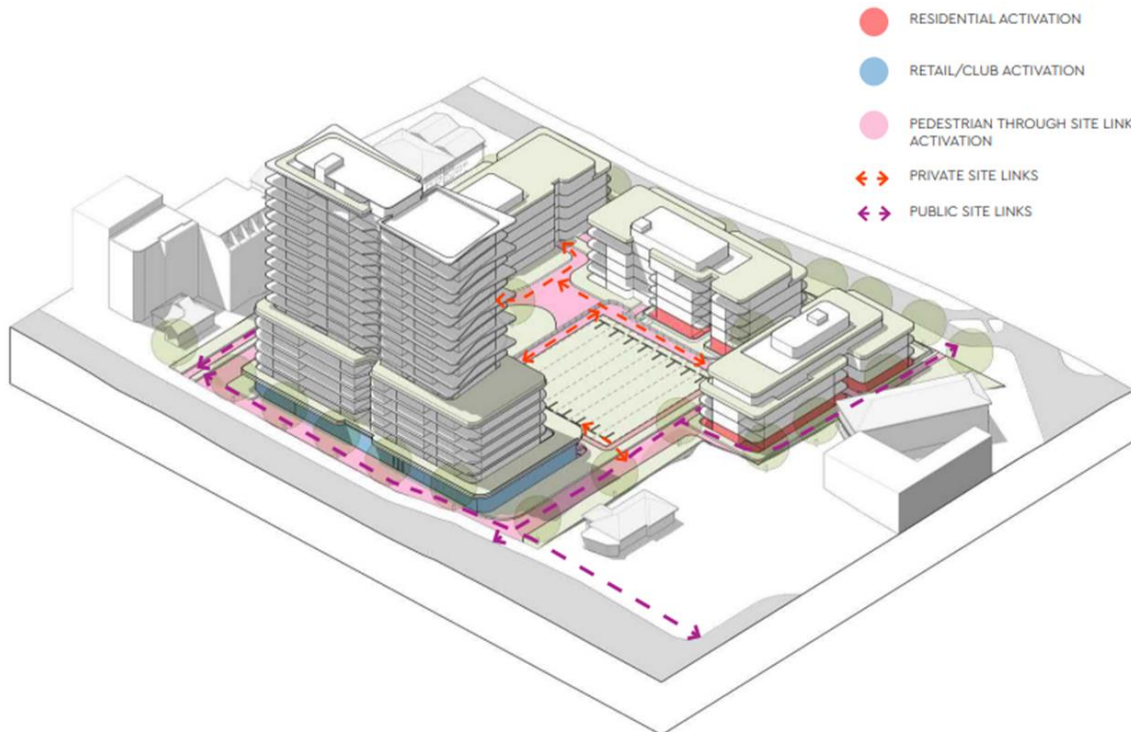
Activation of Old Northern Road and through site links (Source: Altis)
